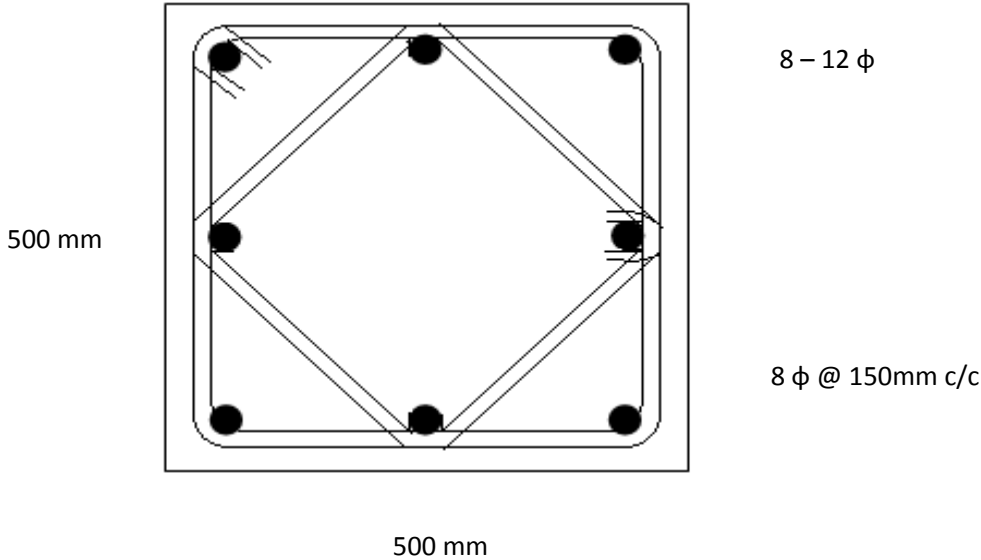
Reinforcement Details for Pedestal of Building A in Plan
